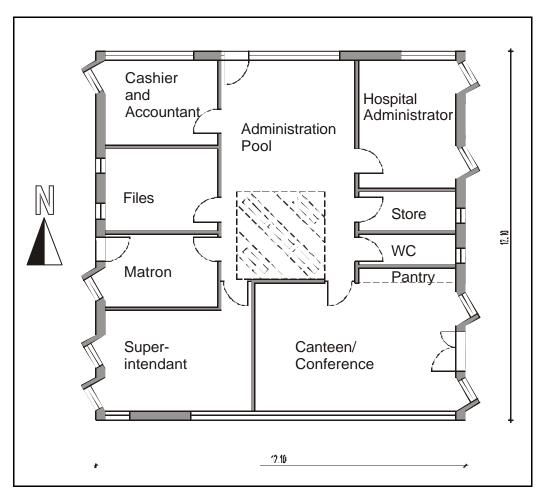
Floor plan of the administration building at Virika hospital with modified windows on the east and west façades and a skylight in the middle of the building.
